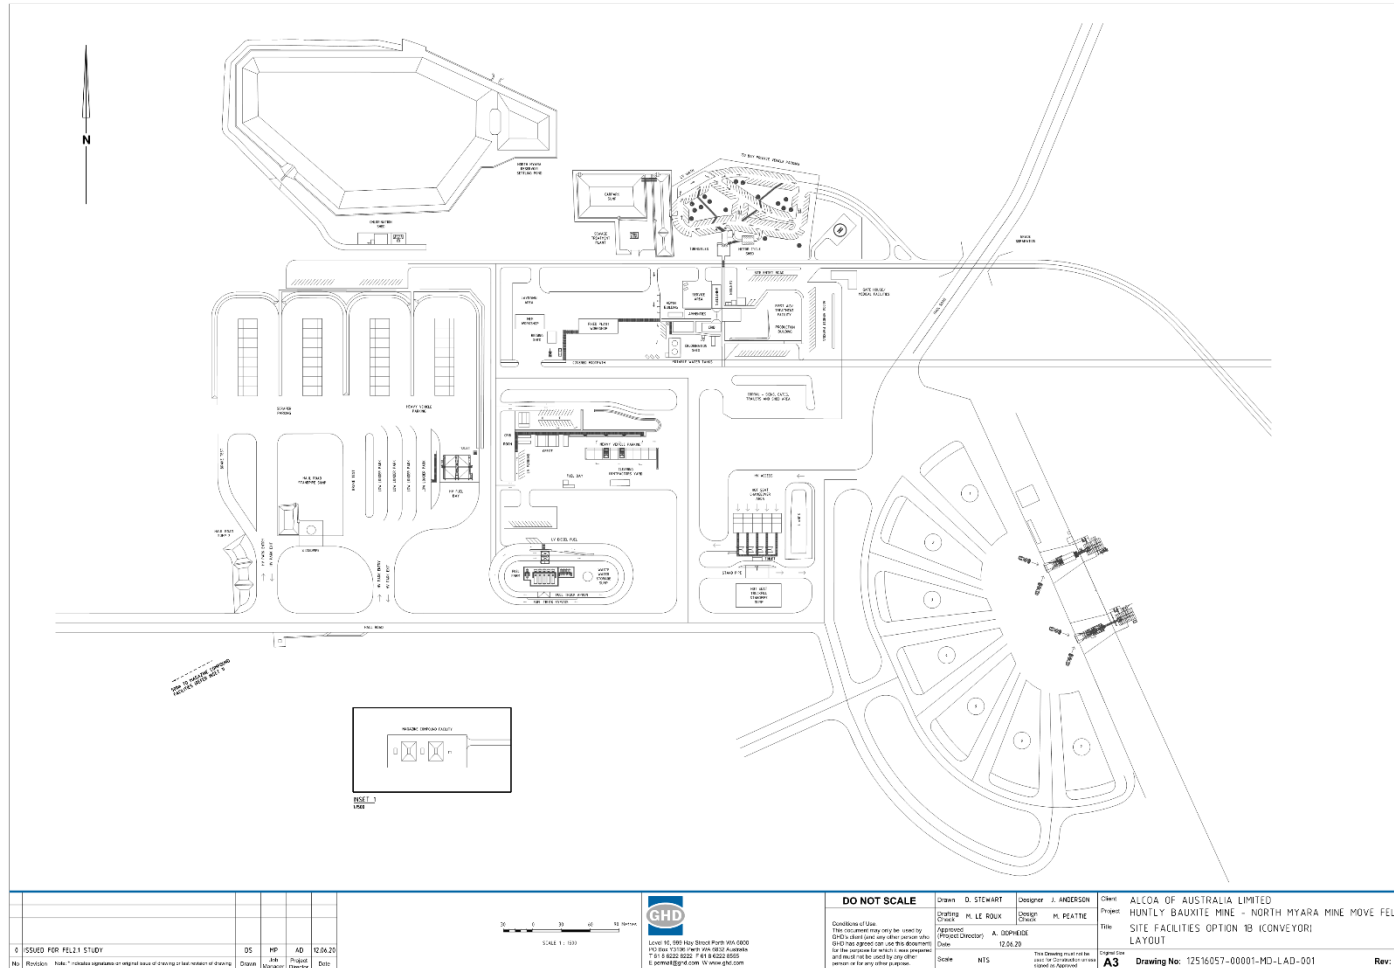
Proposed Myara North Mine Facilities Area – Indicative Layout
